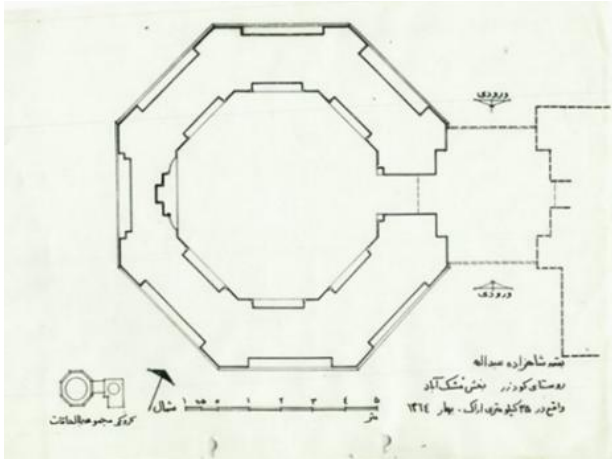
Floor plan of the Imamzadeh Abdullah building (Source: Arak Cultural Heritage Documentation Center)
